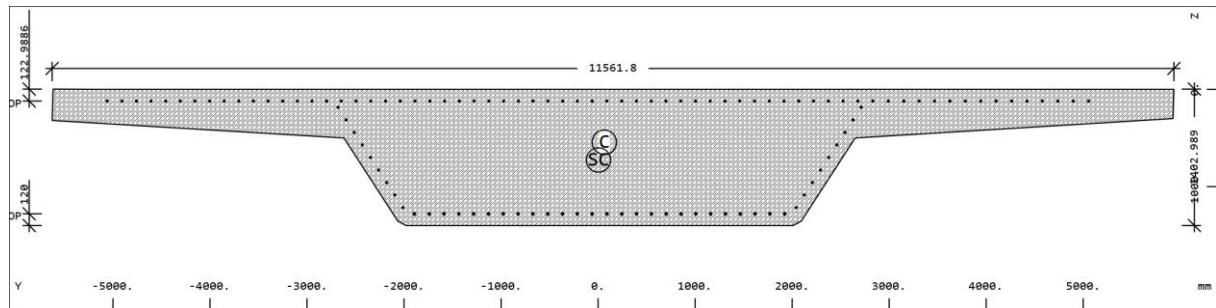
Cross-section of bridge deck from Sofistik, dimensions given in millimetres
